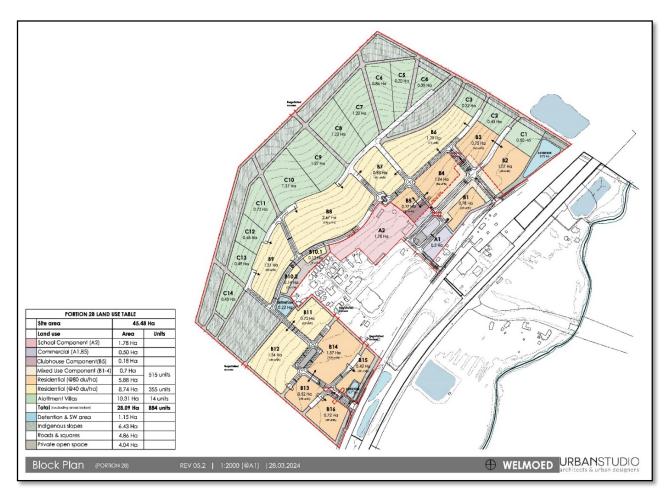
Proposed Site Development Plan (Urban Studio, March 2024)
